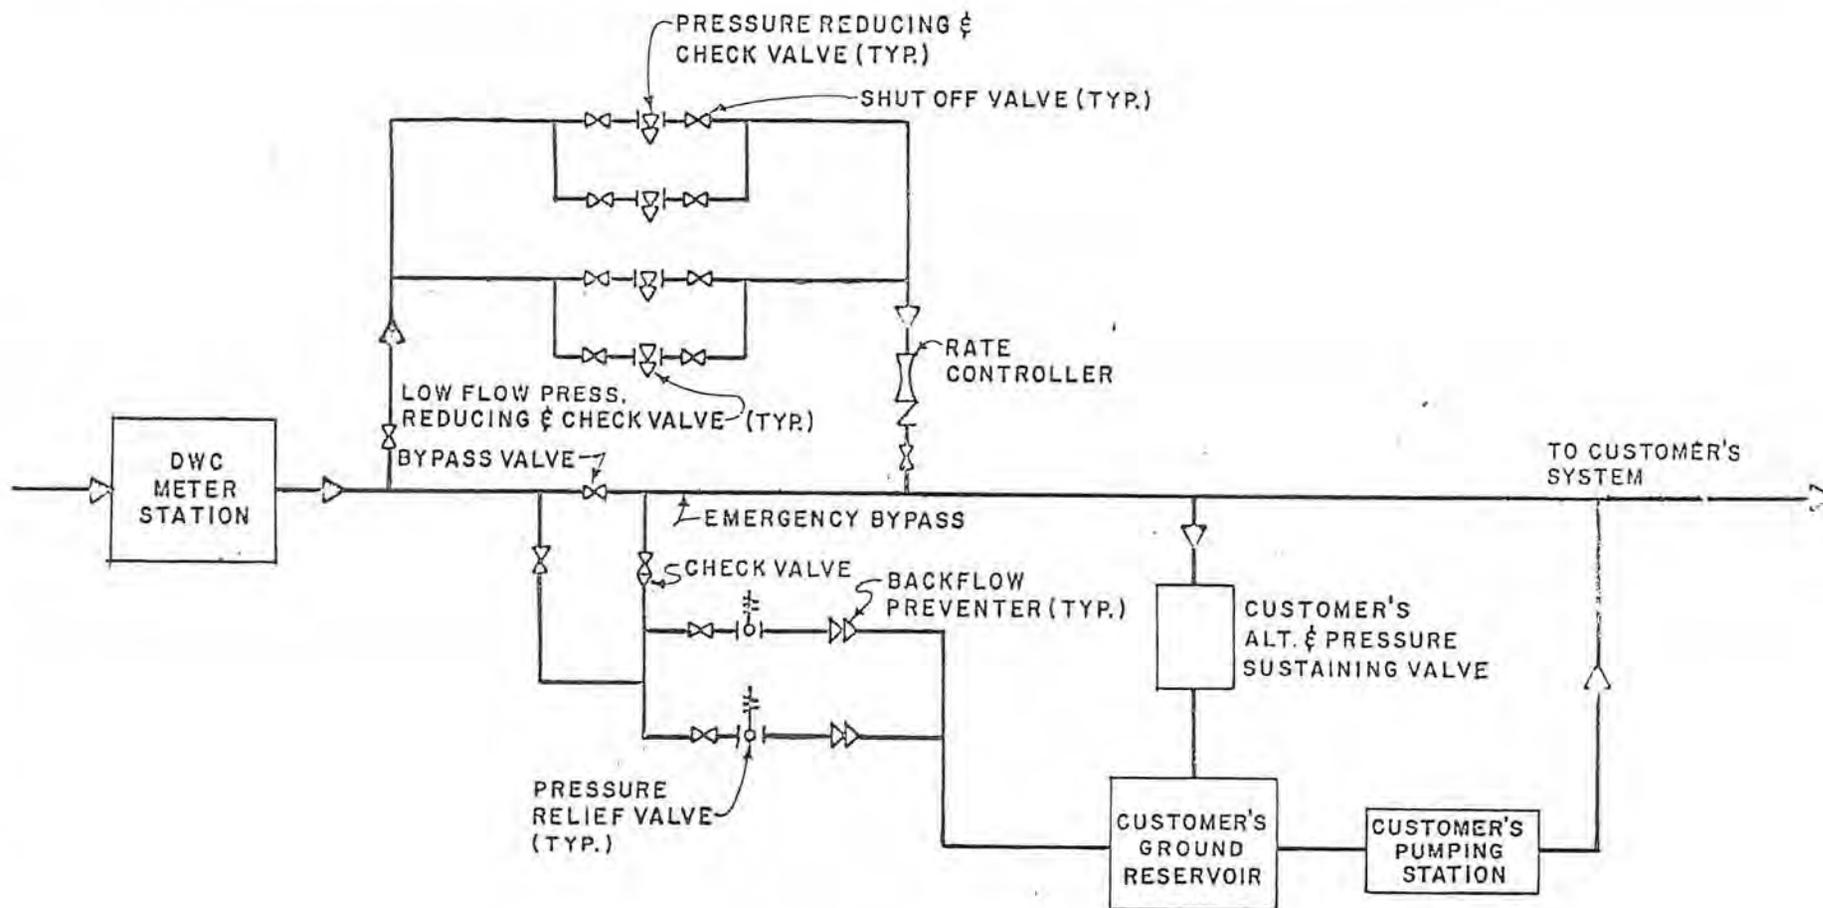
MONTGOMERY UNIT SYSTEM CONNECTION FACILITIES
